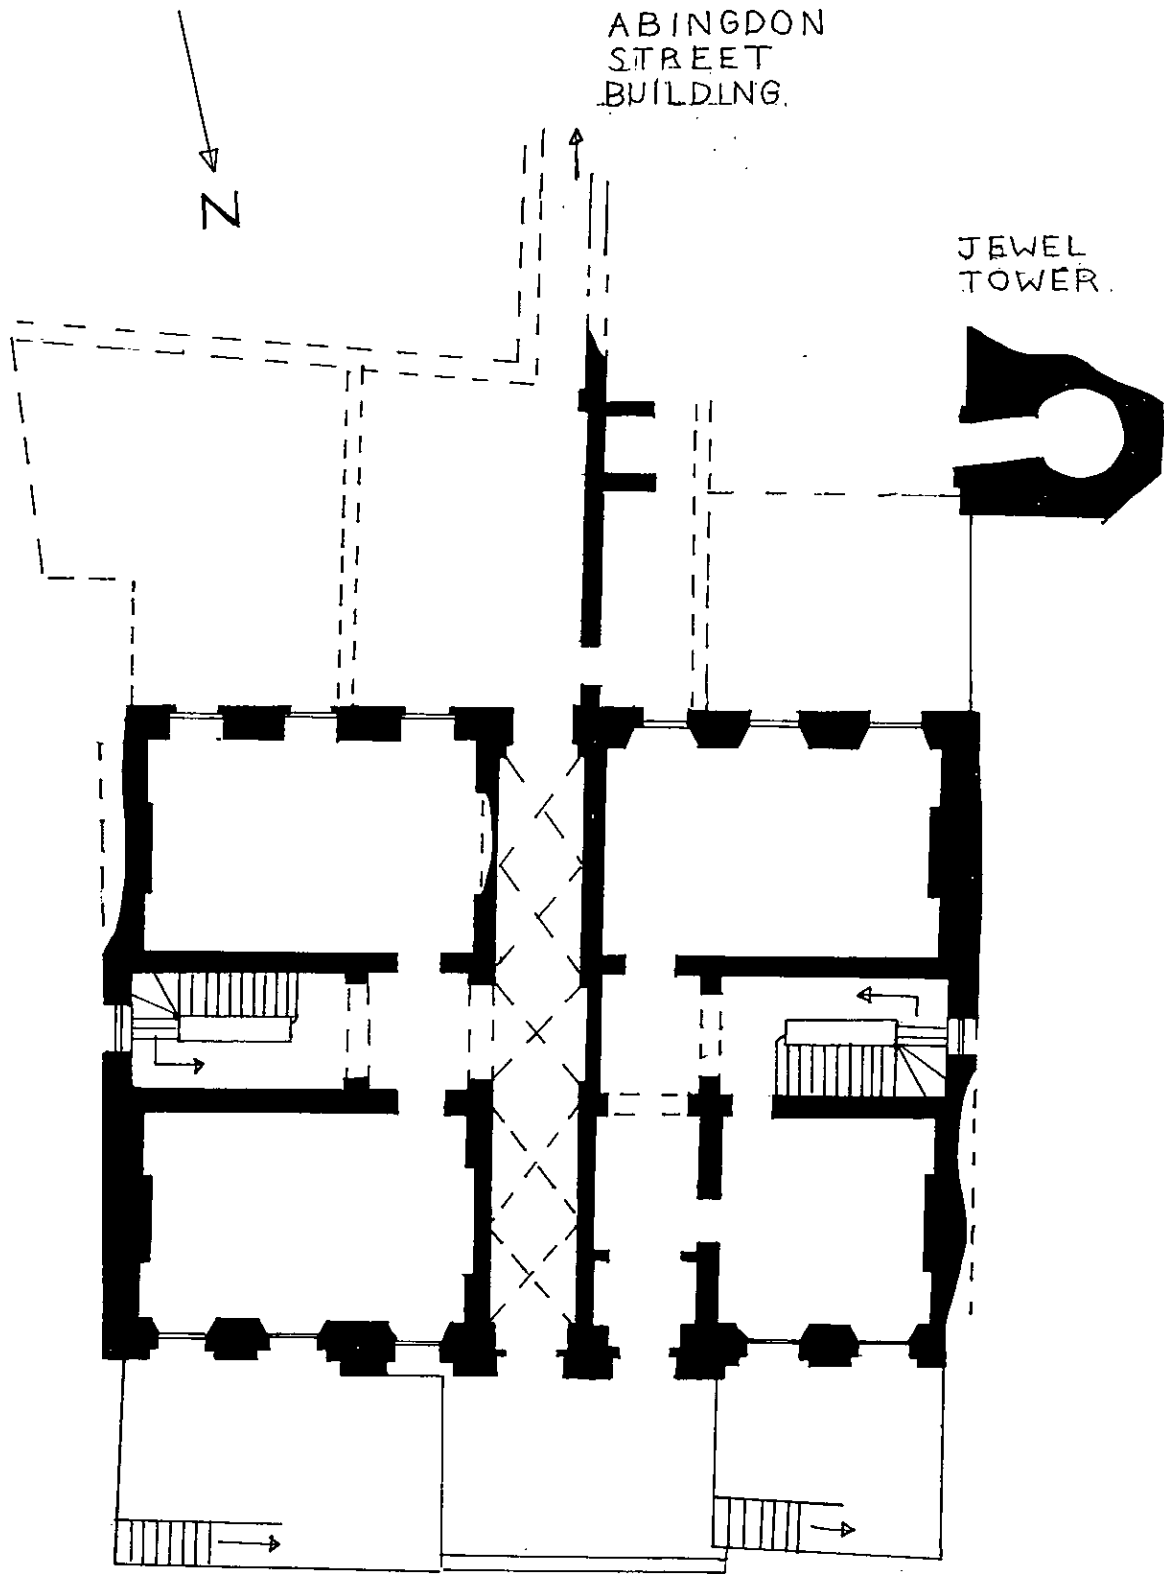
Conjectural reconstruction of the ground floor plan in 1793. Not to scale (RCHME)
